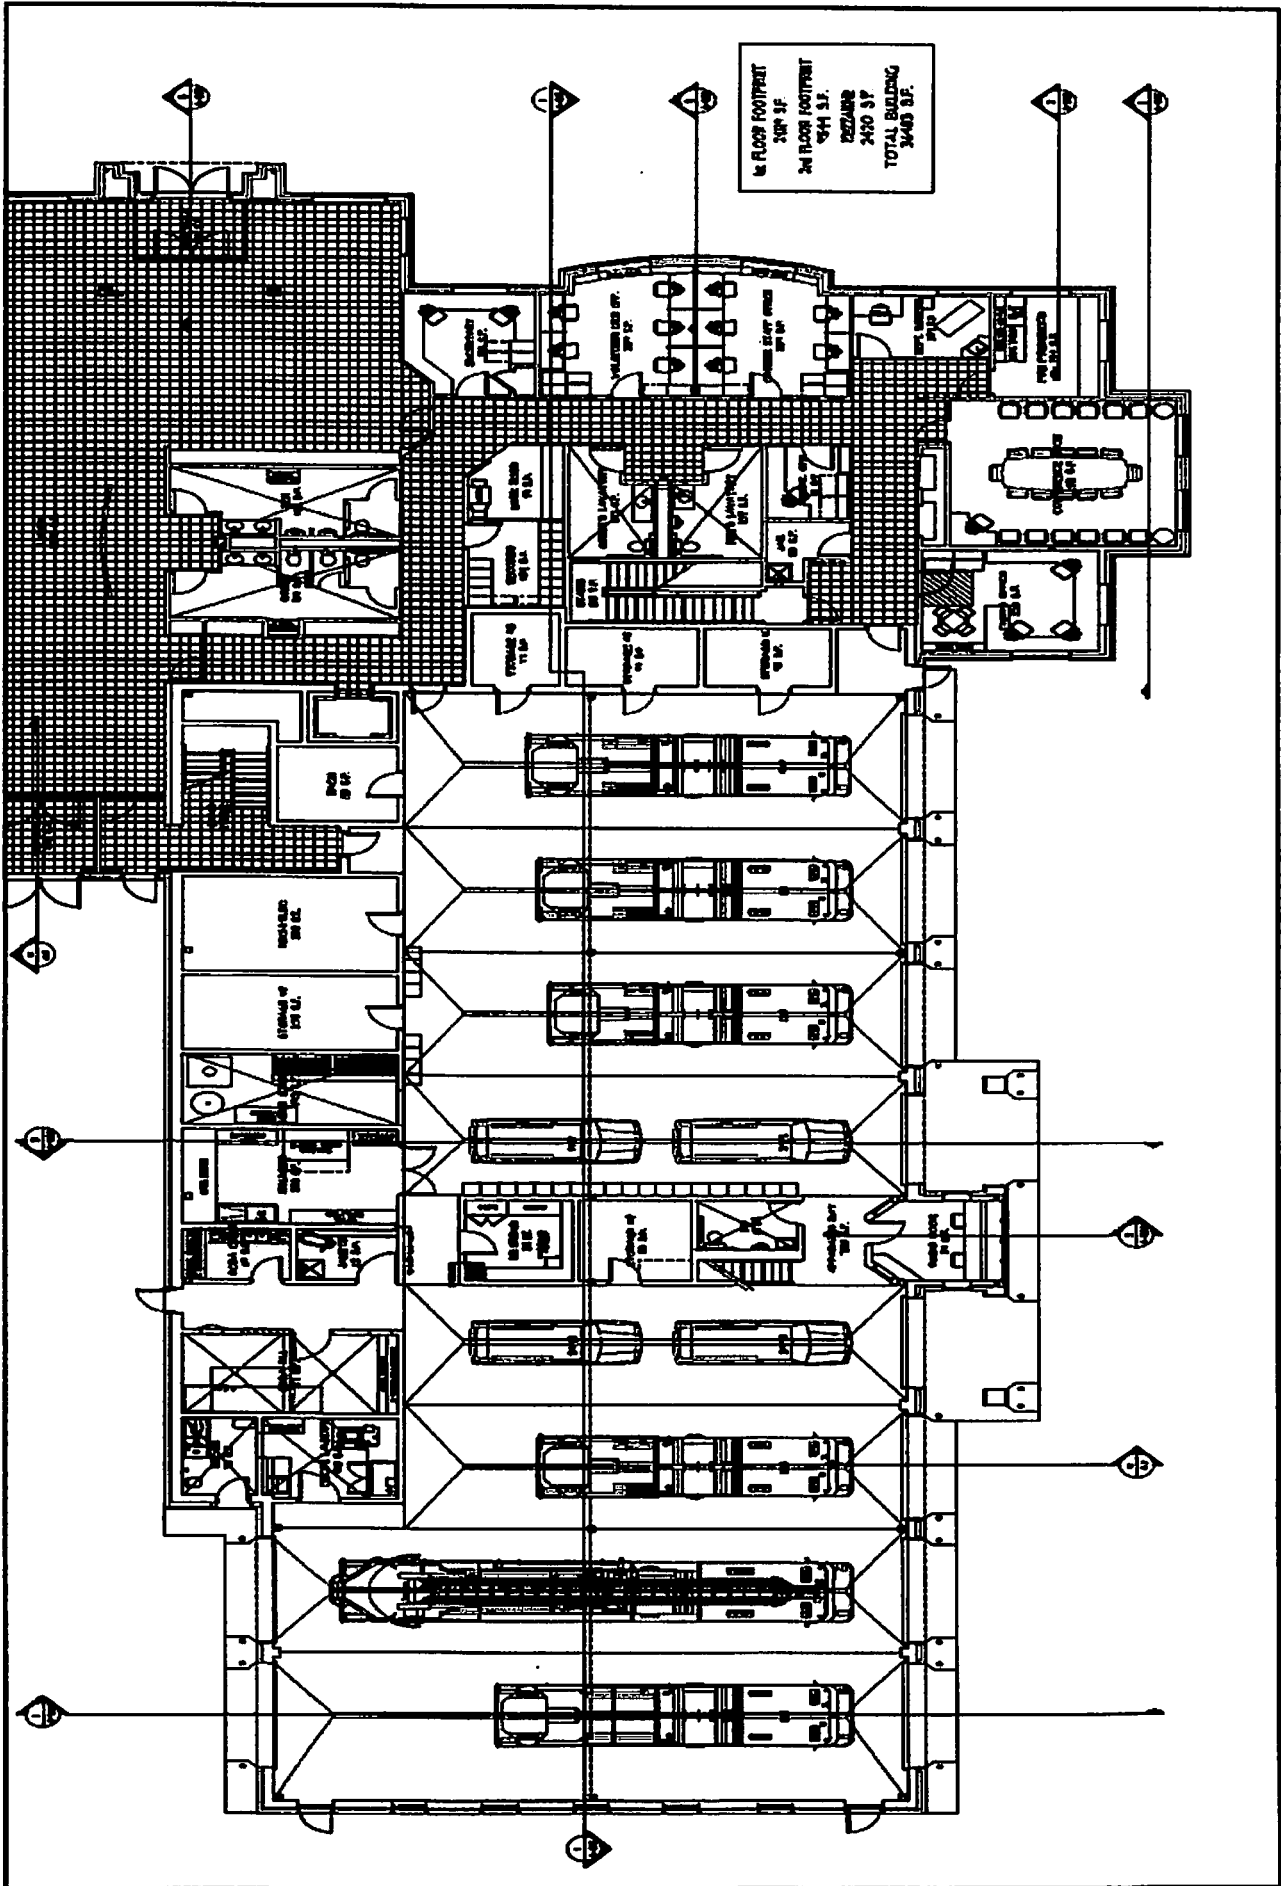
First Floor Plan (Broad Street with Portion of Main Street)
